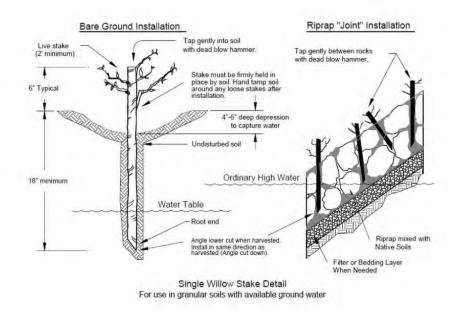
Typical Detail for Single Willow Stake (UDFCD 2001).
